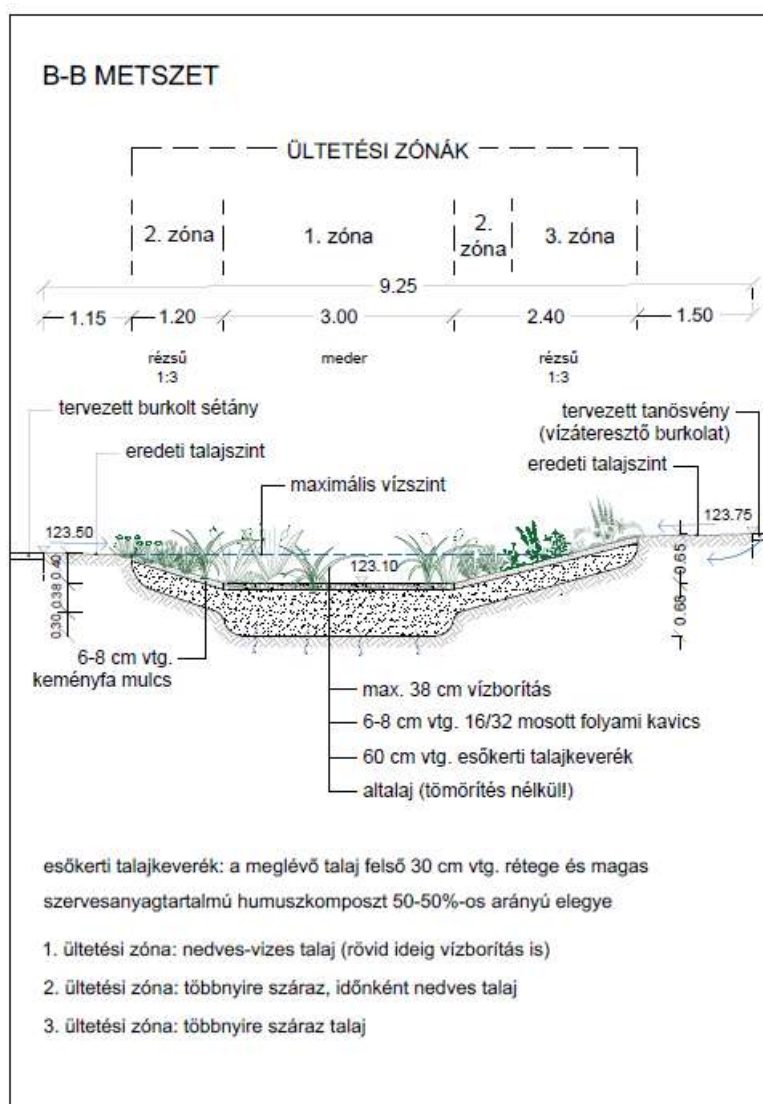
The construction of raingardens is described in detail in BP18 design plans (Annex BP18 design plans Chapter 3.1)
